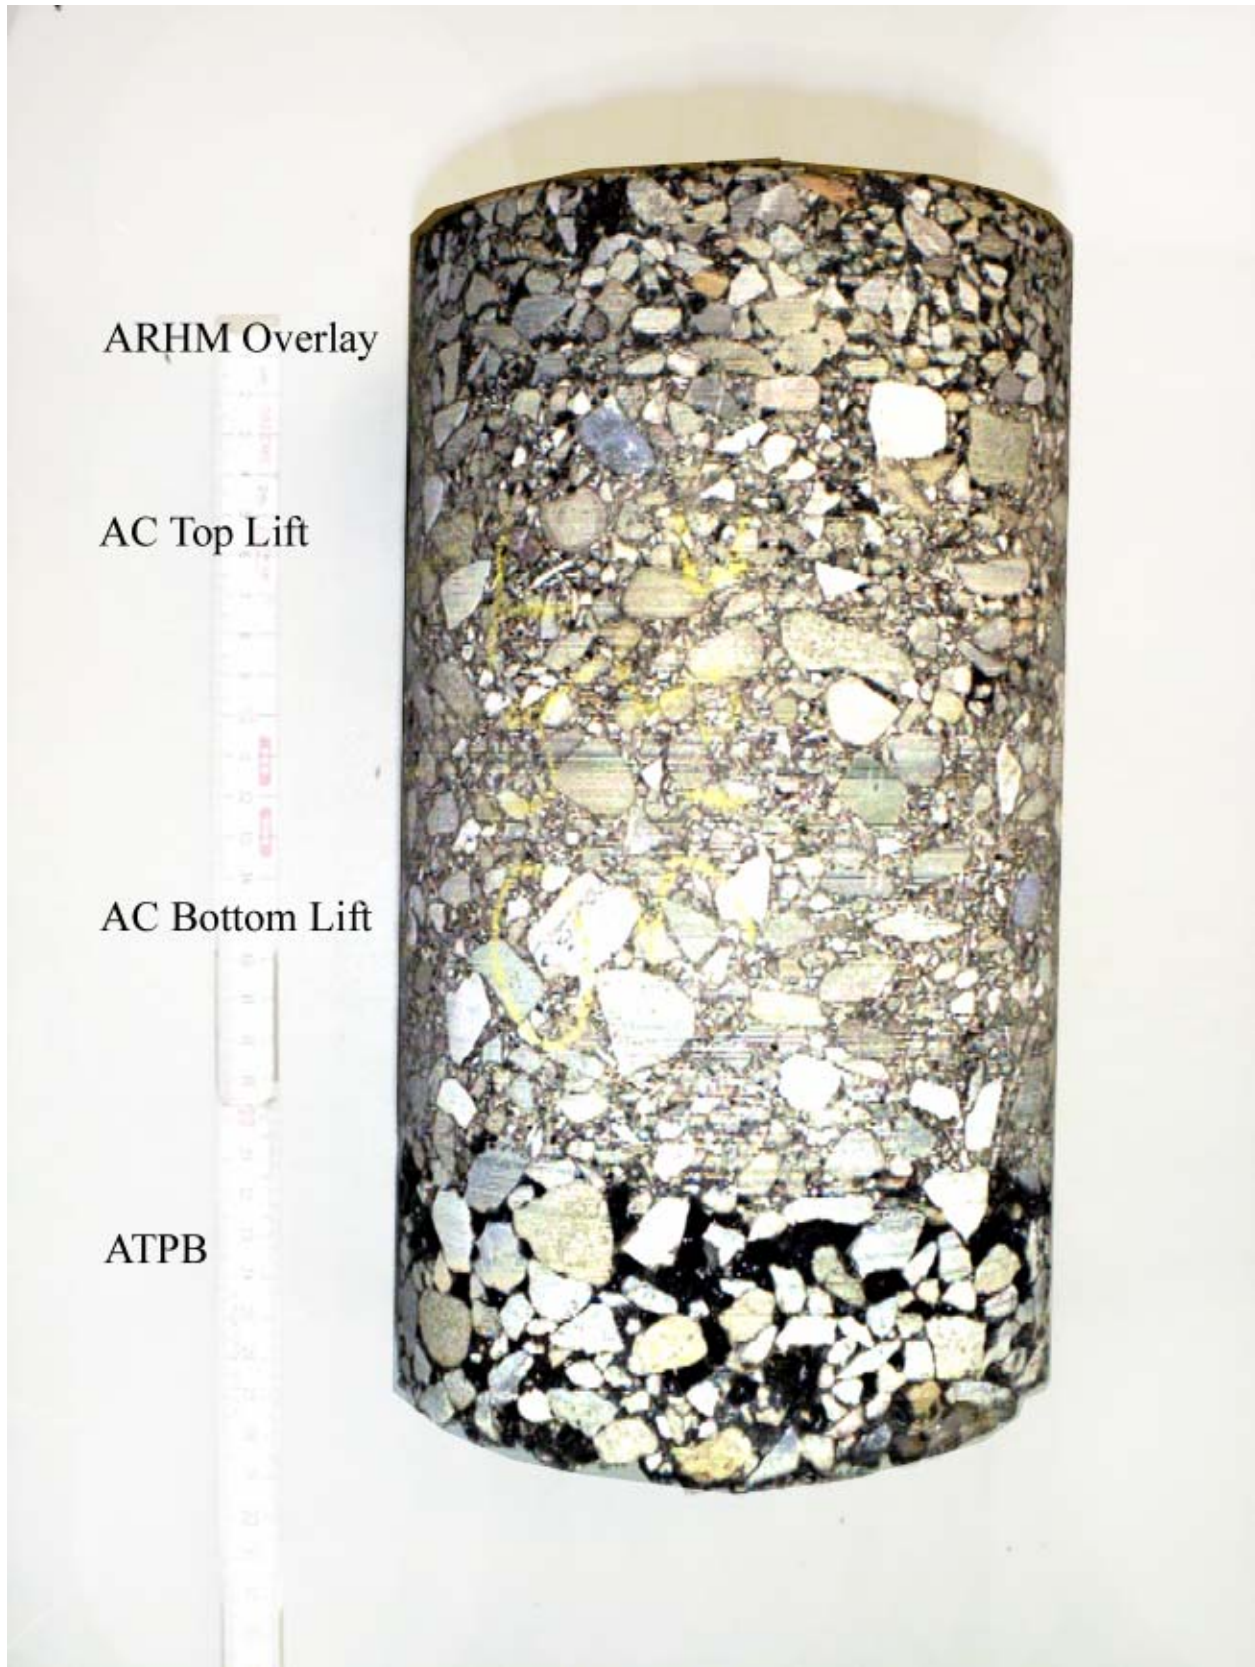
Core extracted from outside the trafficked area at Station 13, Section 543.
